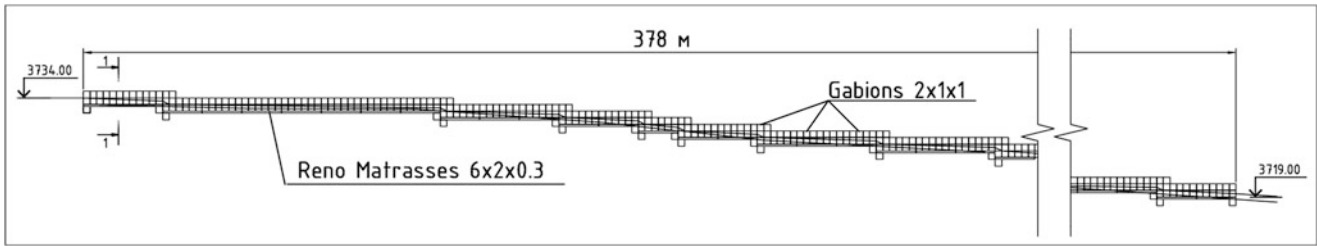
Longitudinal section: Option 2 structure of the spillway on section 1b—cascade gabion ladder
